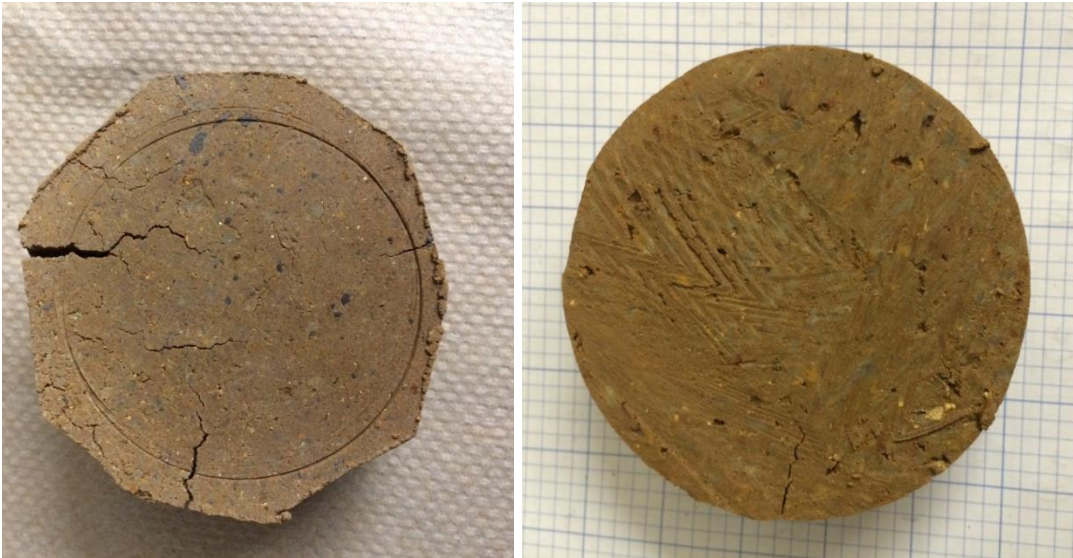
Cracks in Specimens Compacted Wet after Moisture Conditioning
